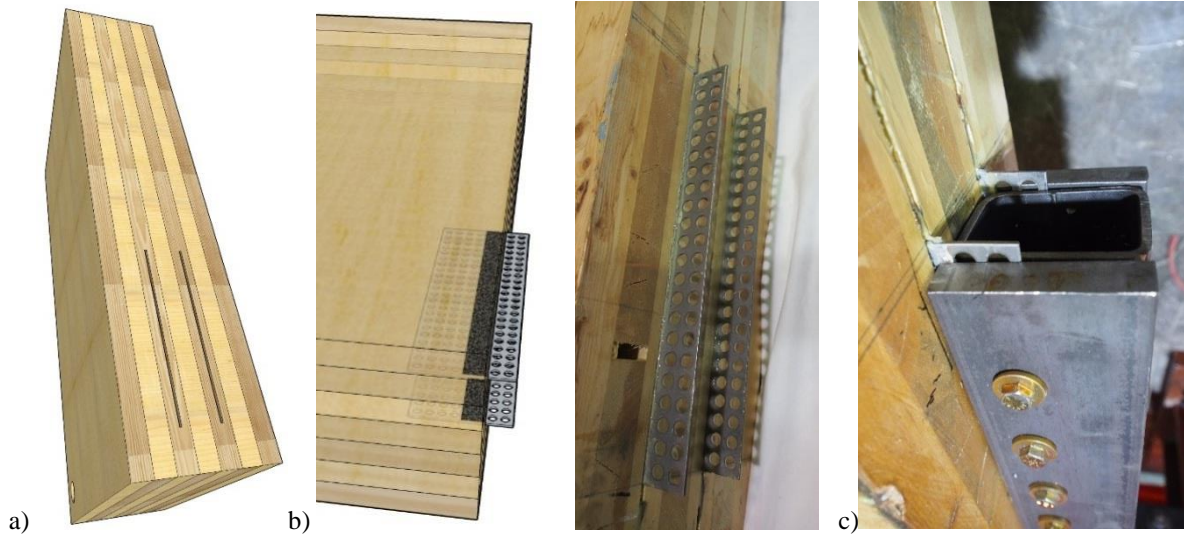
Preparation of test specimens: a) Cutting of the slots in CLT panels; b) Embedding of perforated steel plates; c) Clamping the perforated steel plate to steel profile
